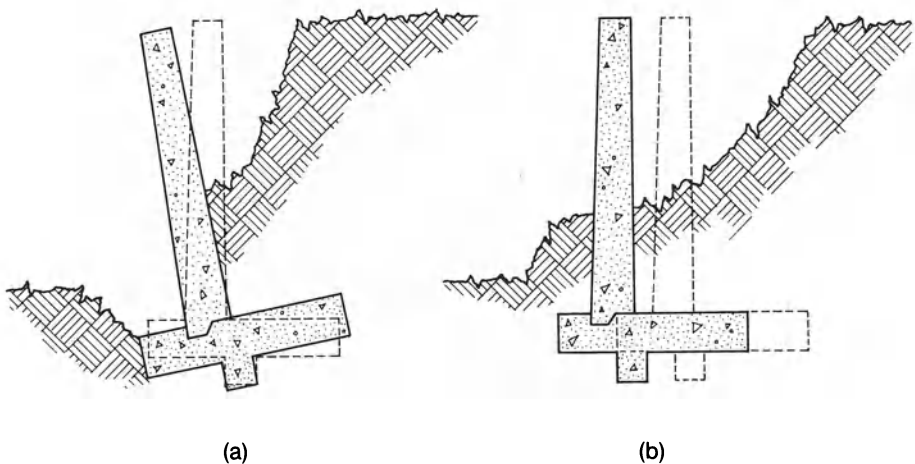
Failure modes of a cantilever retaining wall, where (a) indicates failure due to overturning, and (b) indicates failure due to sliding.
